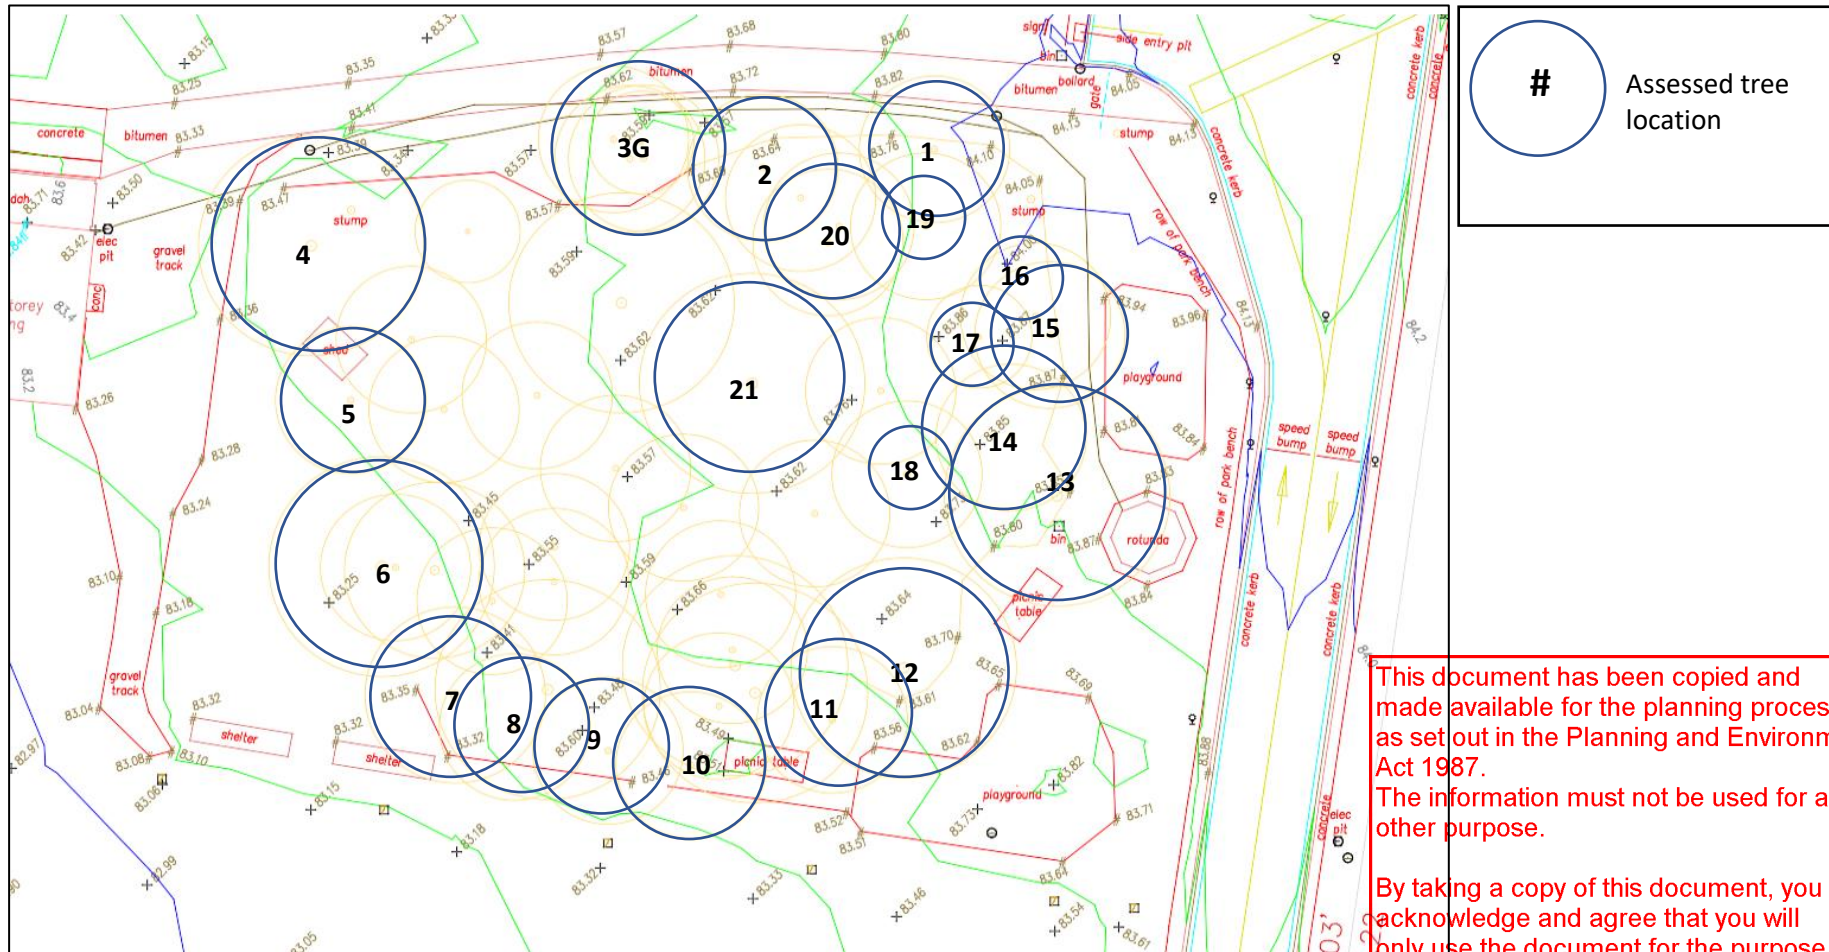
Re-establishment Plan & Features Plan (One Plan Land Development Group)
